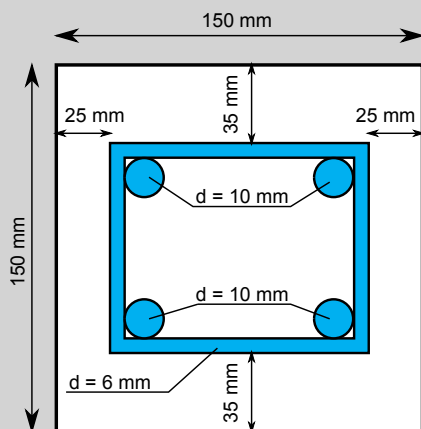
Sectional layout of the main longitudinal reinforcement and stirrups.
